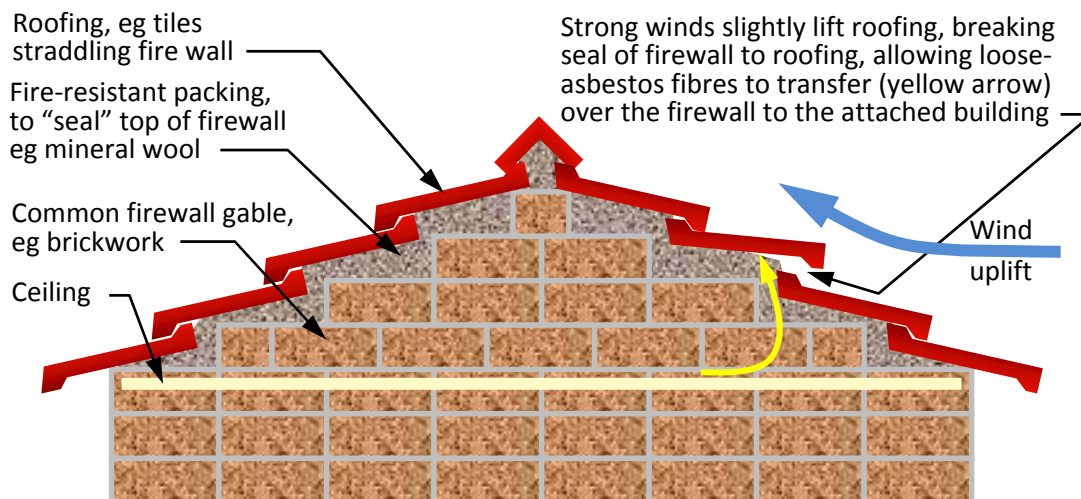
Typical cross section through roof space near common firewall connecting attached buildings
